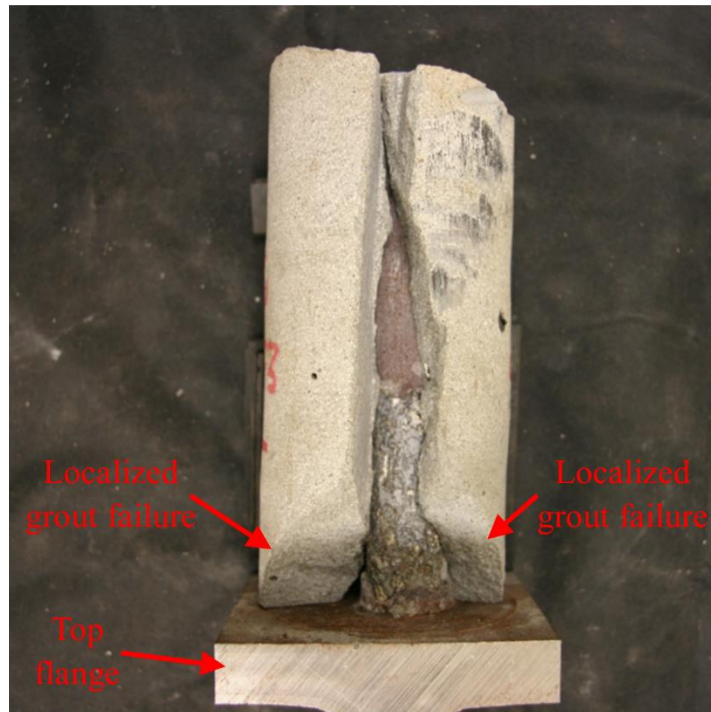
Photo. Typical large-scale fatigue test core showing shear failure in grout.
